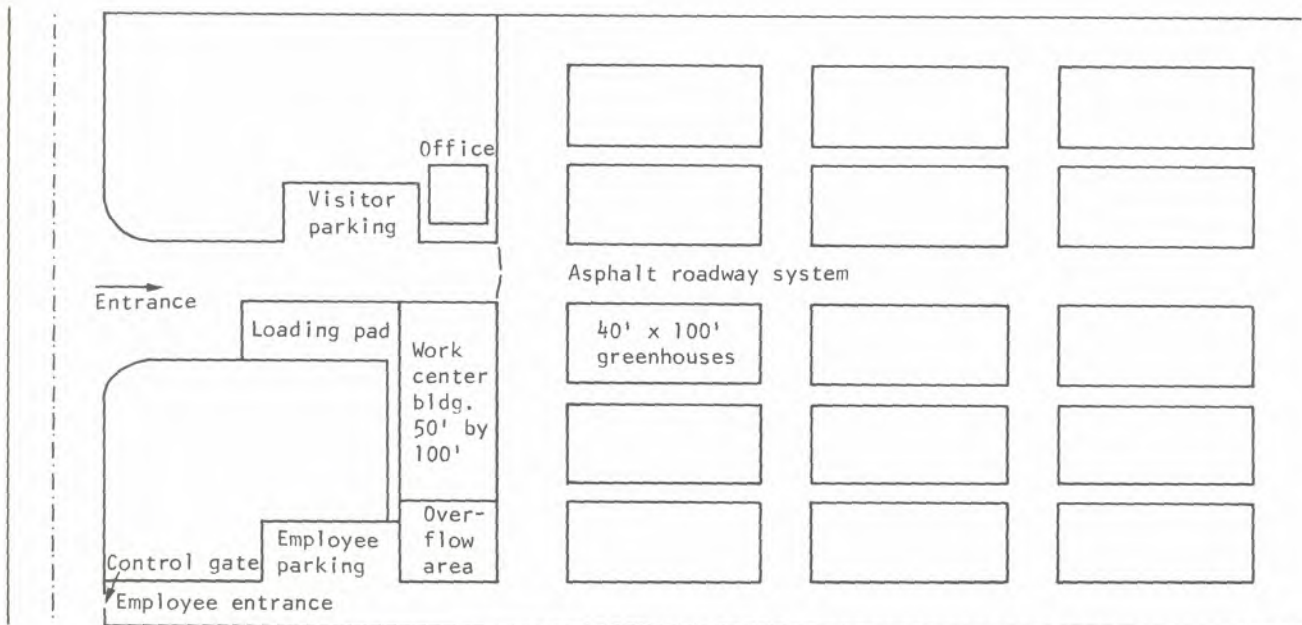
A 50- by 100-foot clearspan building plan designed as a work center complex.
